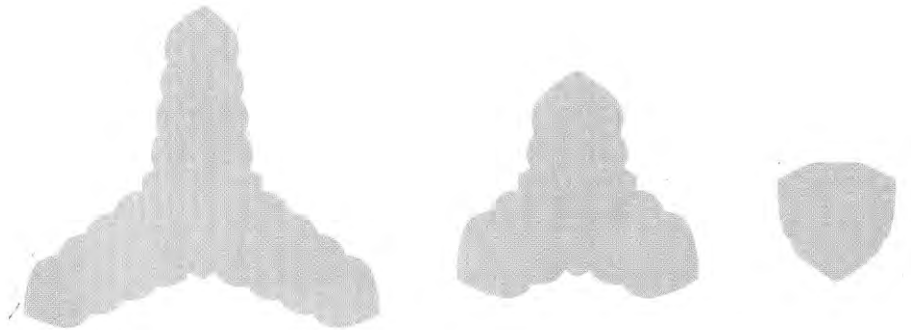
Floor Plan at Ground Level, at an Intermediate Elevation and at the Top of the Tower
